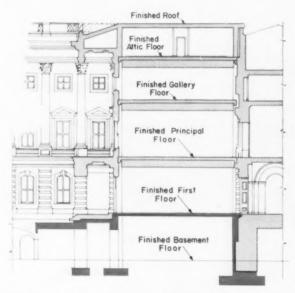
Passages connecting wings had to be built with floor supports directly above the existing foundation wall.
